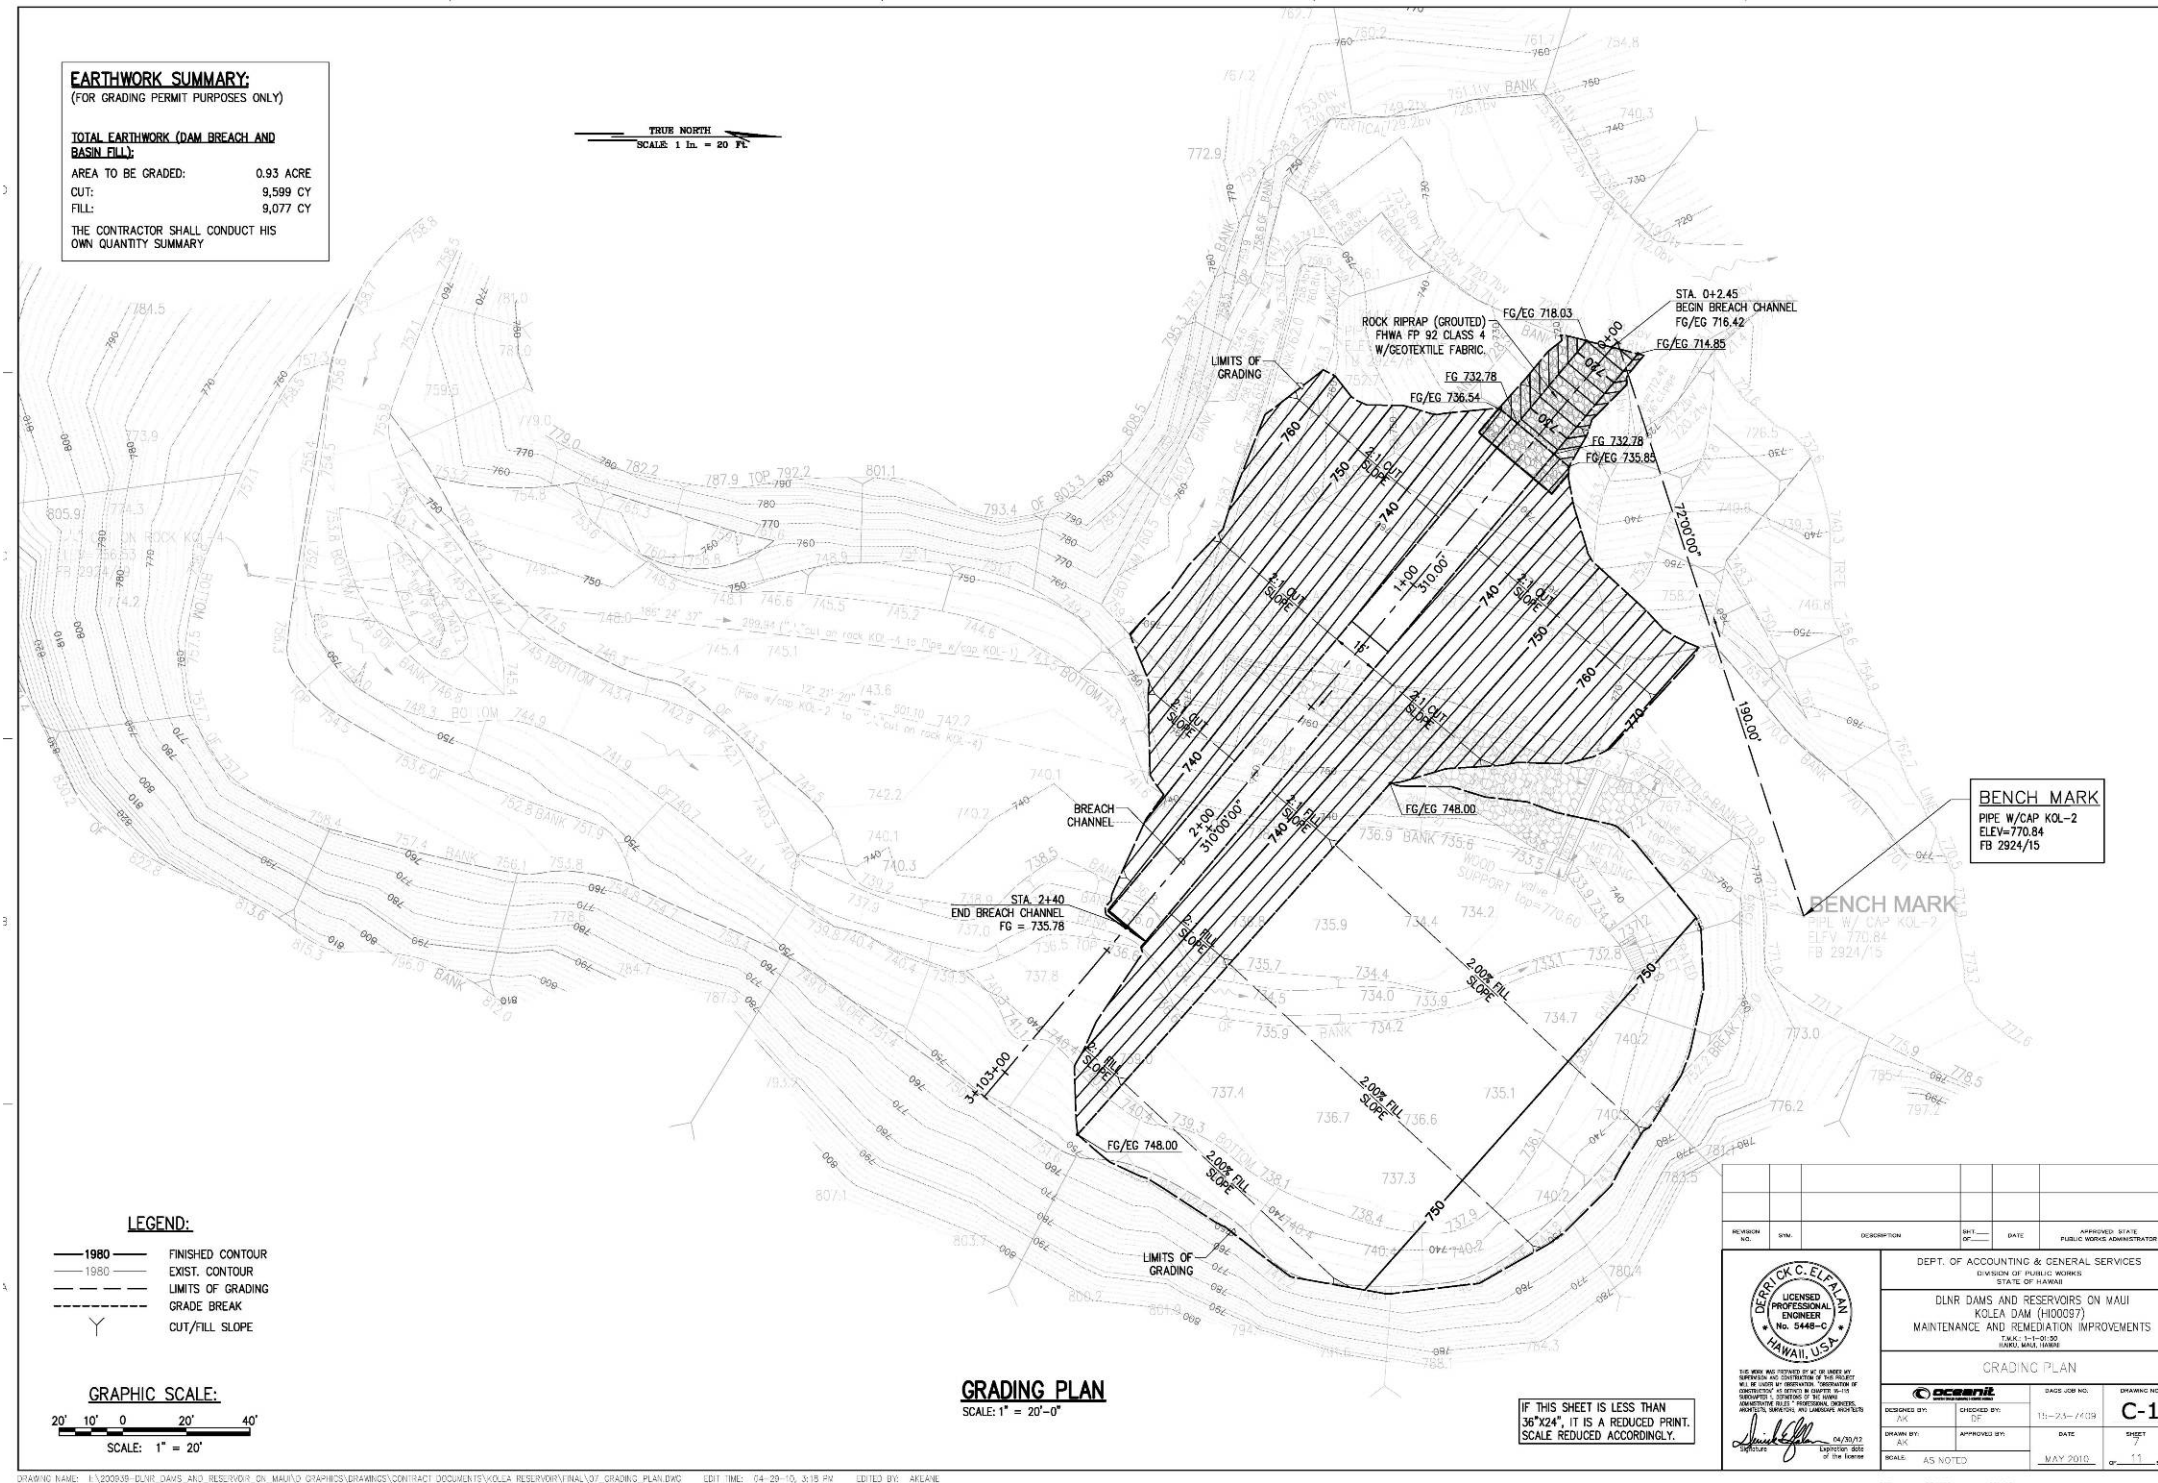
Proposed Project Alternative: Removal of Dam – Grading Plan
